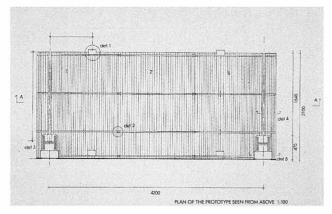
A plan of the prototype, VKRY, architect M. Heikinheimo.
